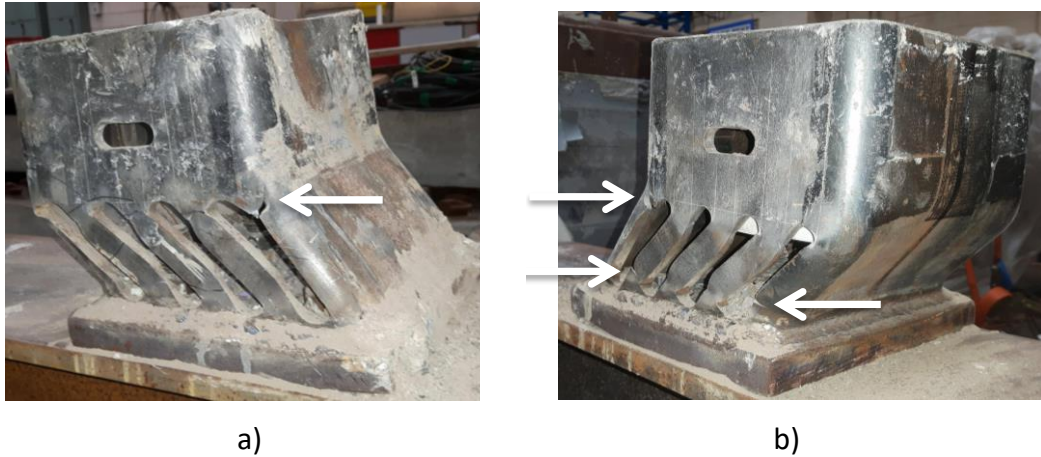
Deformed shape of YP of push out specimen SP1A-View a); and view b)
